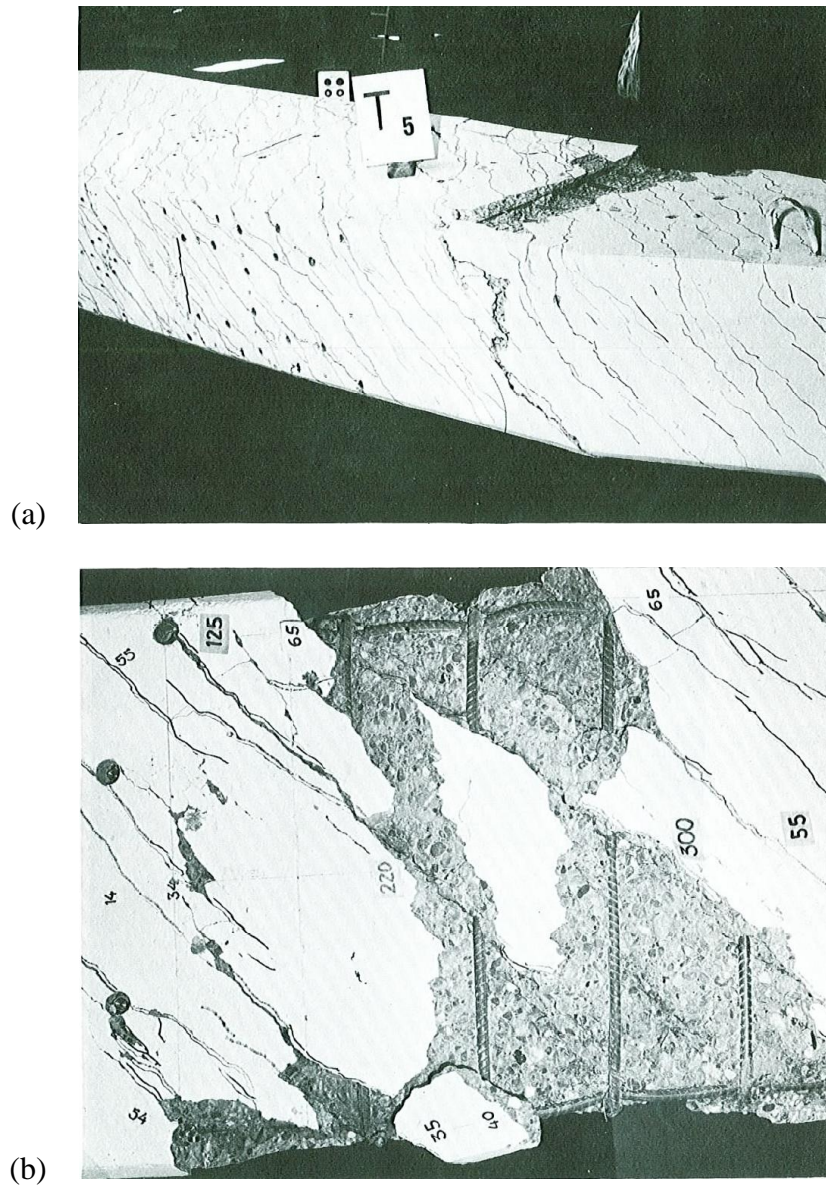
(a) Crack pattern in a RC beam subjected to torsion in correspondence of failure load; (b) typical reinforcement arrangement and crack orientation at failure [5].
